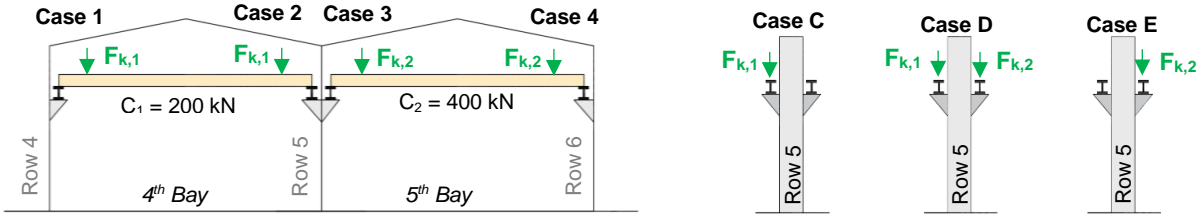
Design situations for runway beams (left) and columns (right) due to actions induced by cranes.
